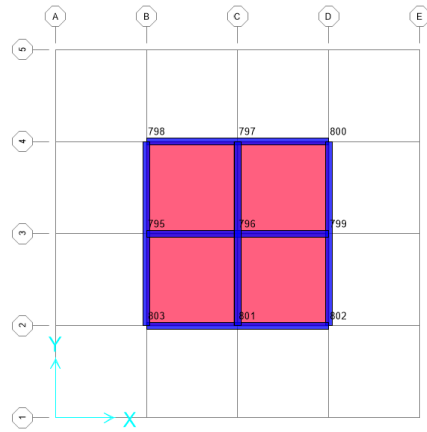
Setback Plan View of G+20 Core Shear Wall Model
